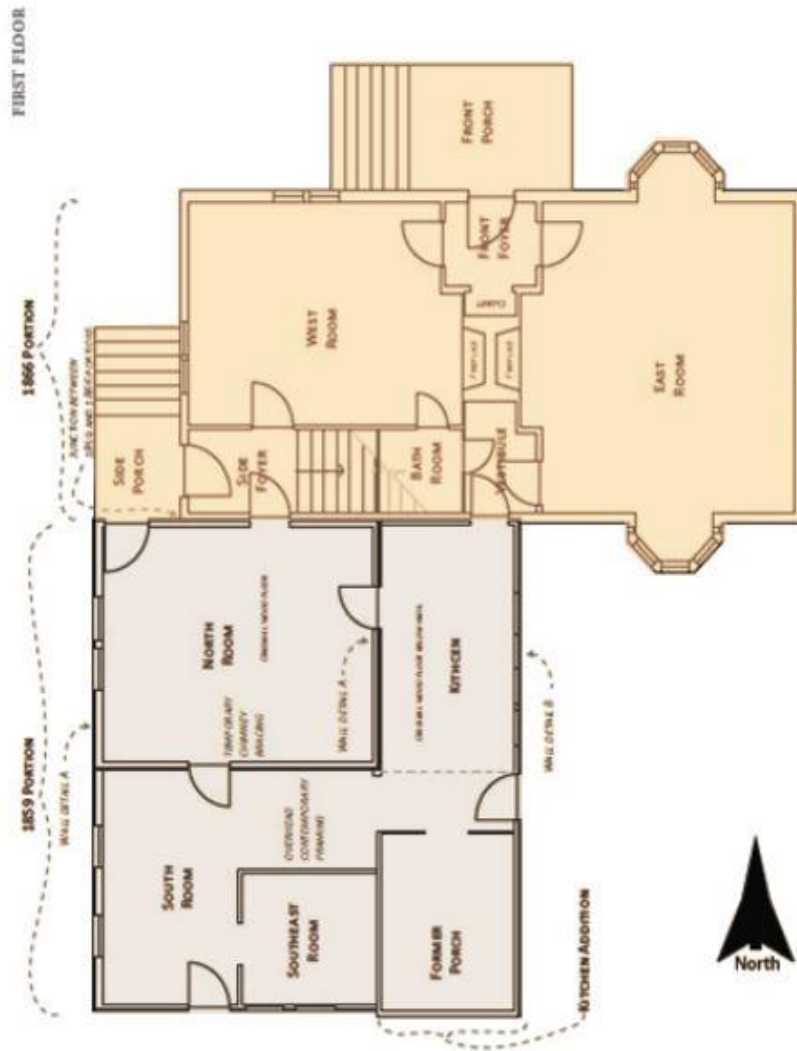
Haller House First Floor Plan. HHHSR. 2014. 98.
